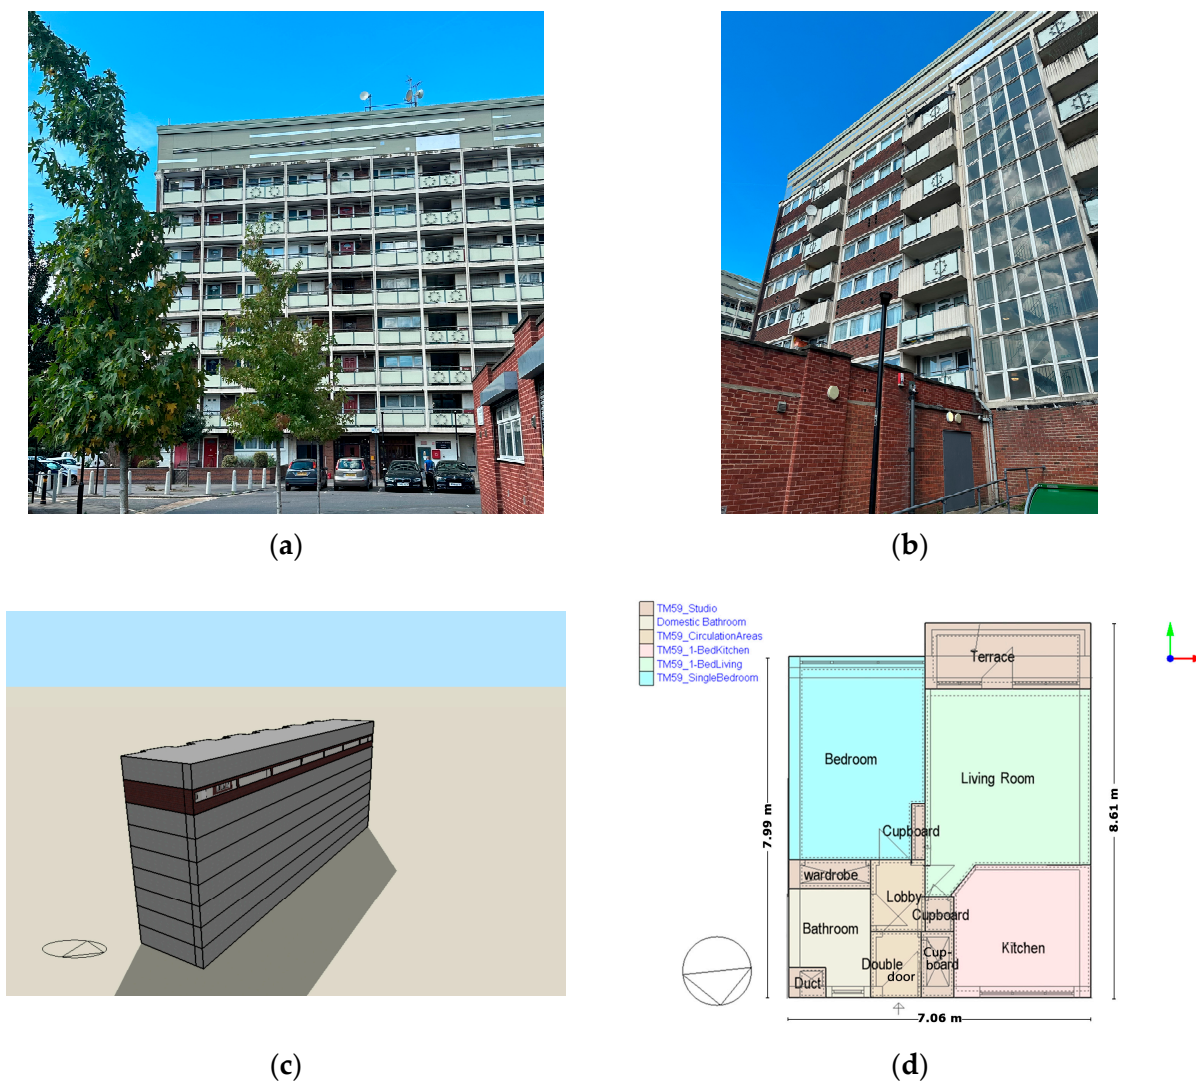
(a,b) The building block; (c) a 3D model of the case study flat; (d) floor plan.
